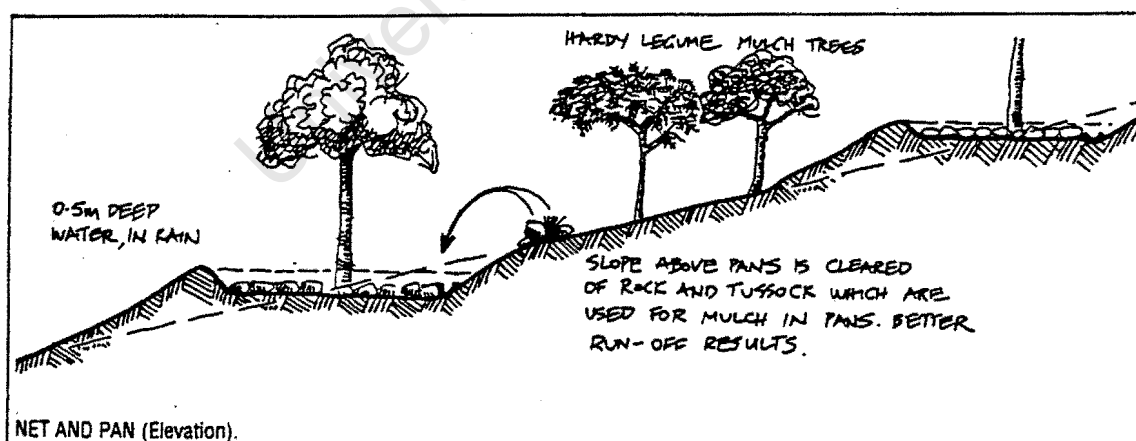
Net and Pan - Elevation (Mollison, 1990, p393)
